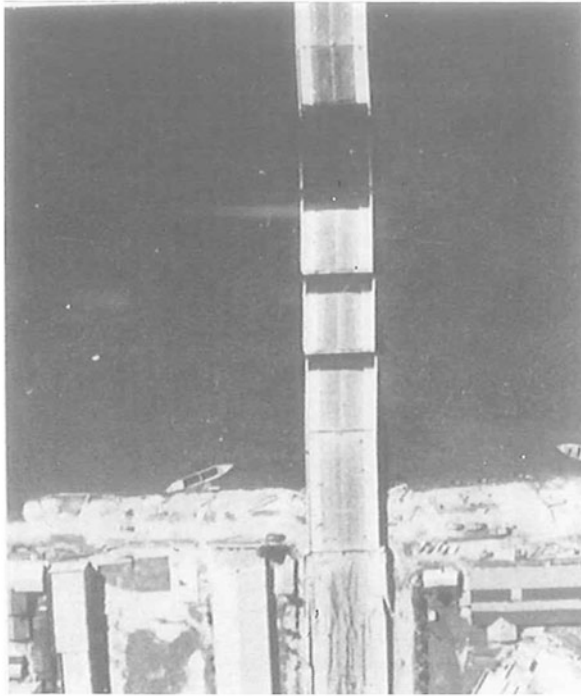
Girders' fall of Showa bridge (1964 Niigata earthquake)
